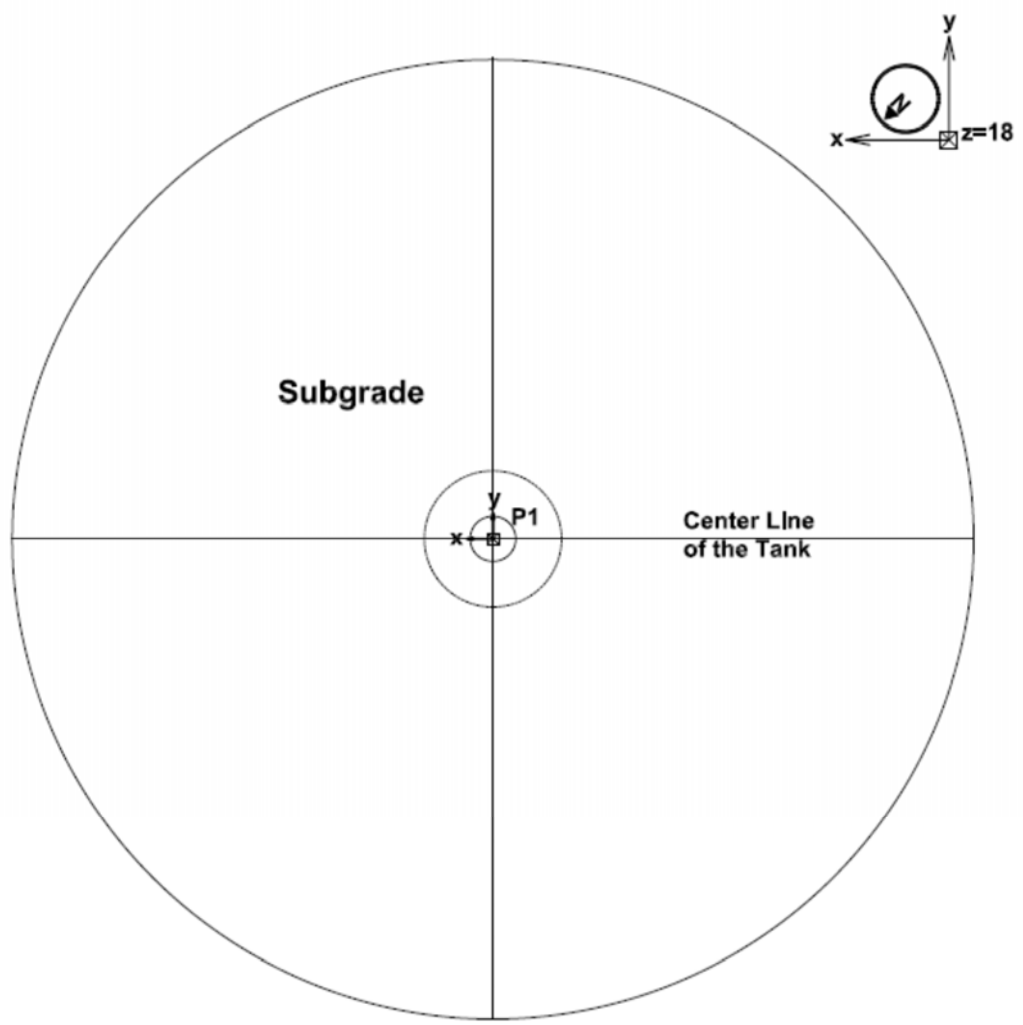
Instrumentation plan for experiment No. 3—Profile view, Z = 18 inches
